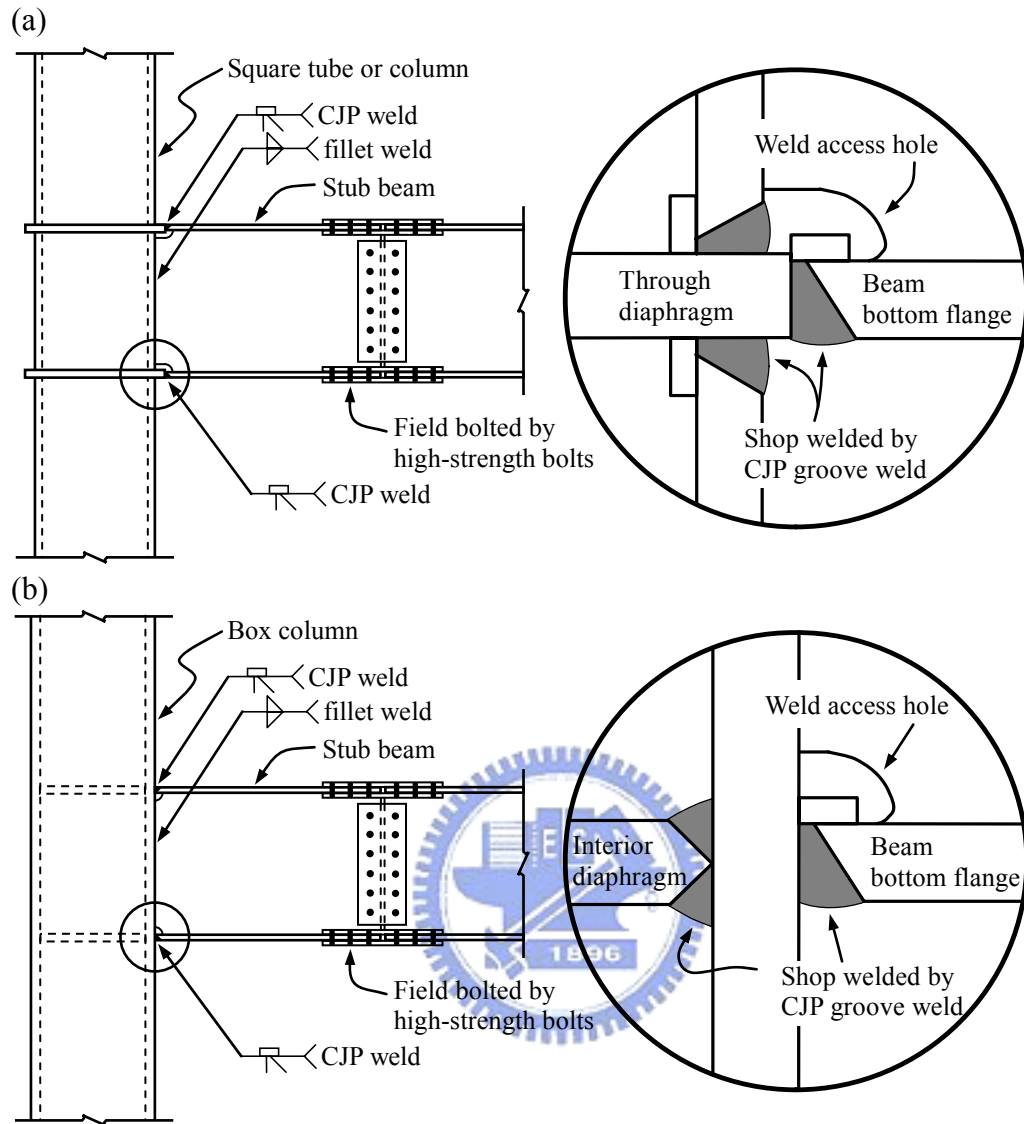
Typical pre-Kobe column-tree connections: (a) Through-diaphragm connection; (b) Interior-diaphragm connection.
